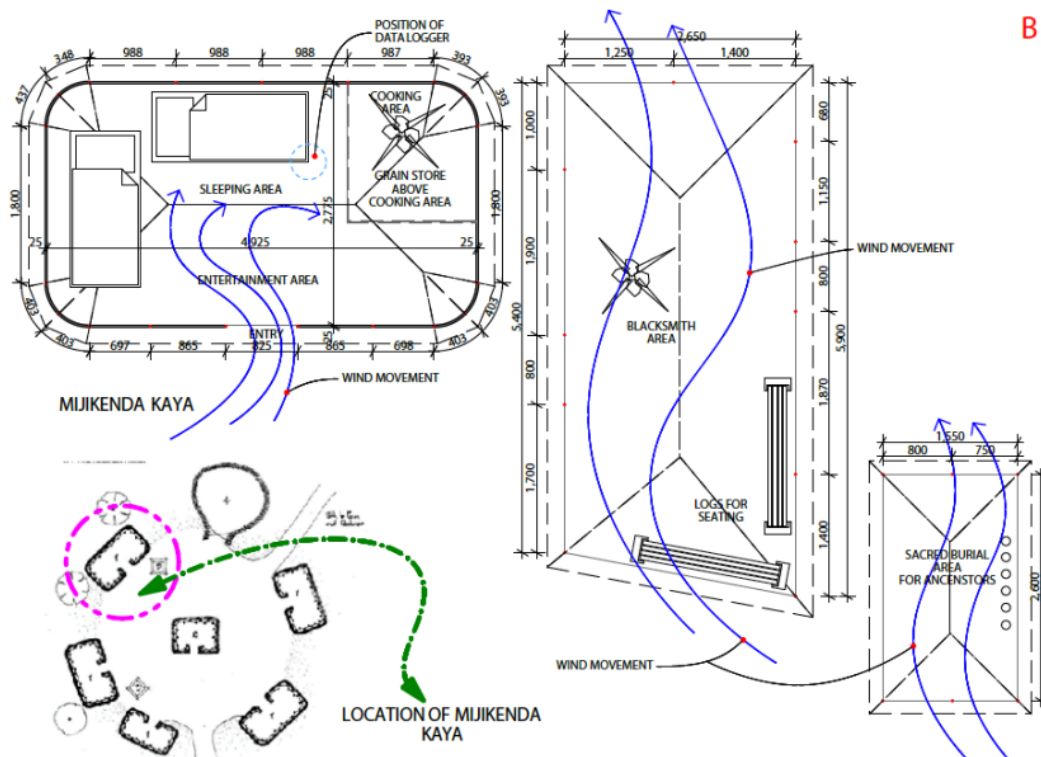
Building with a narrow plan ensures cross ventilation and natural lighting into the spaces.
